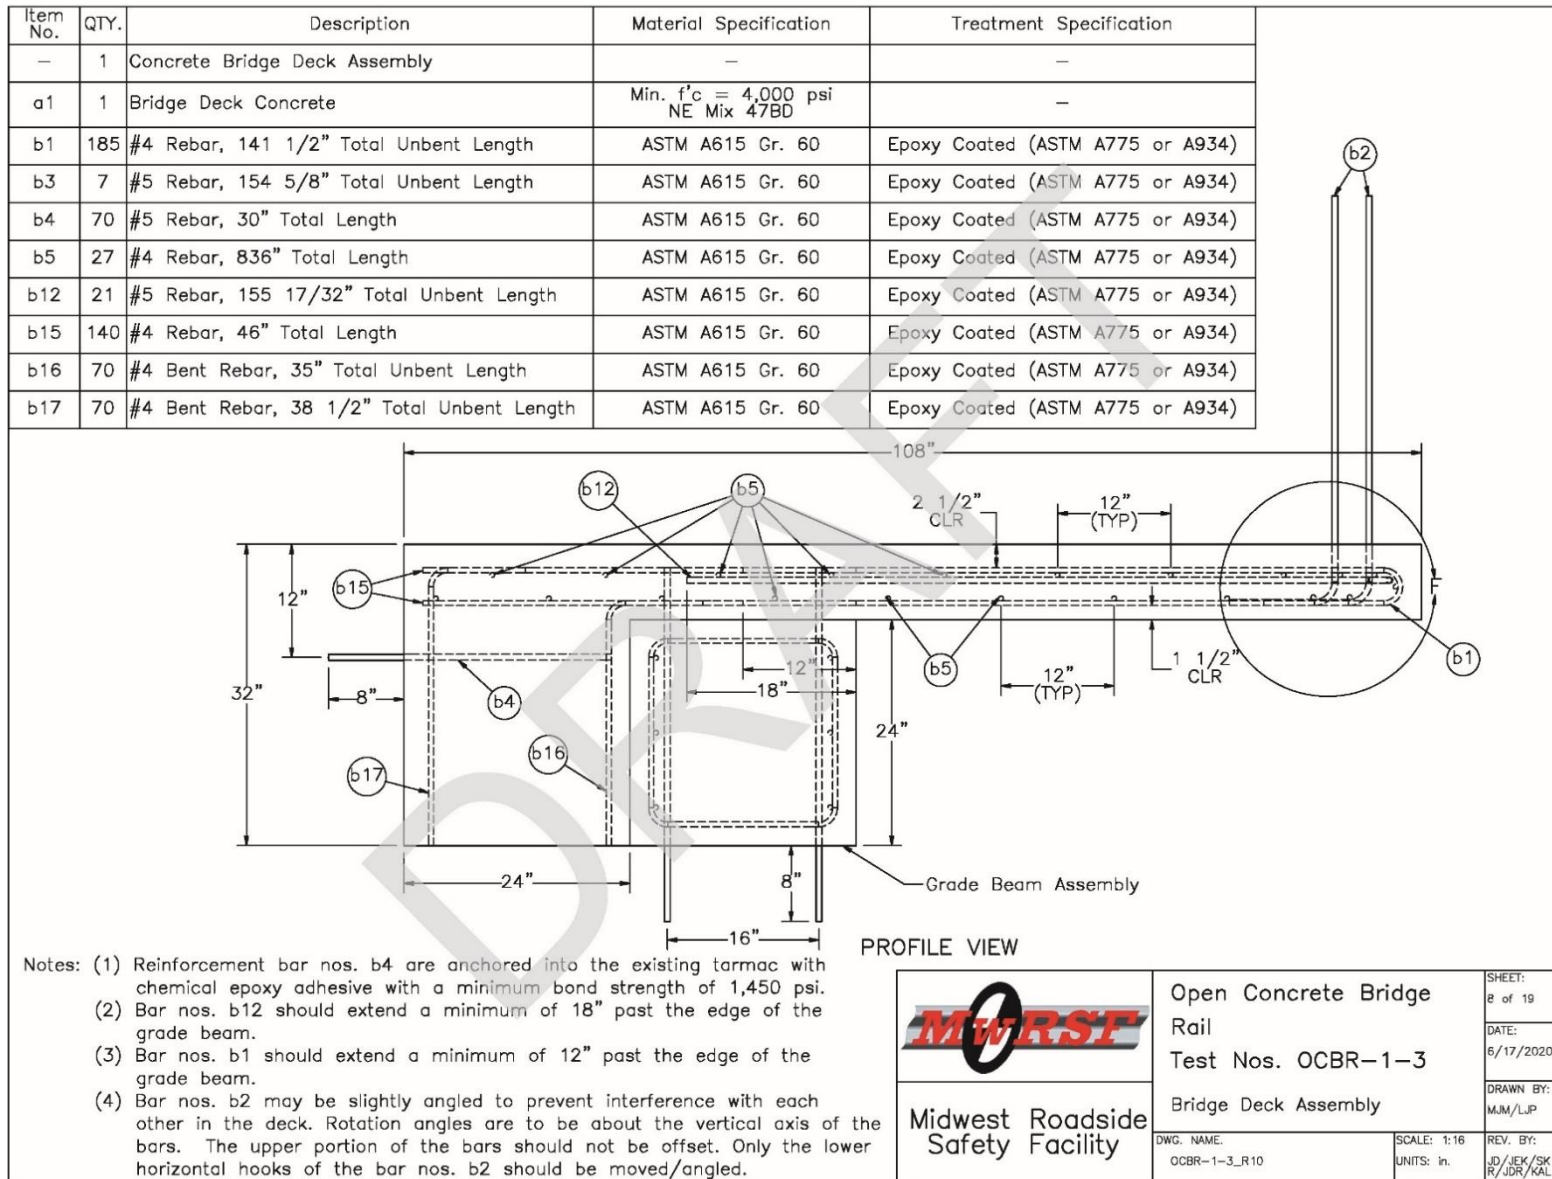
Open Concrete Bridge Rail Bridge Deck Assembly
